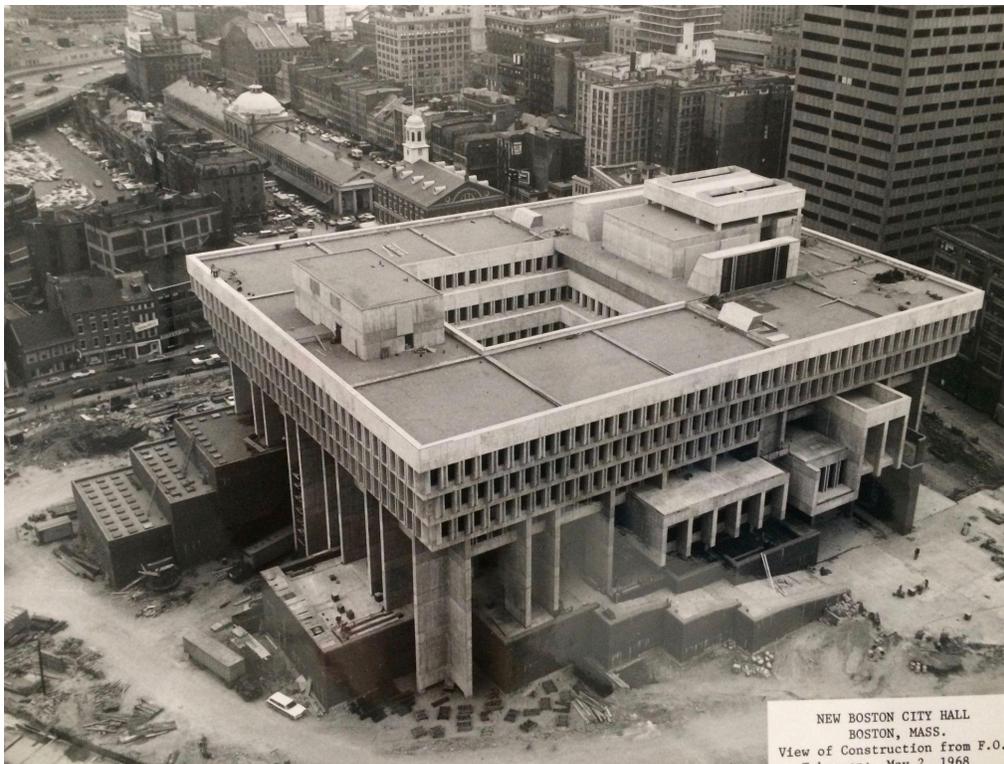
Boston City Hall under construction; looking southeast from JFK Building. (1968)
